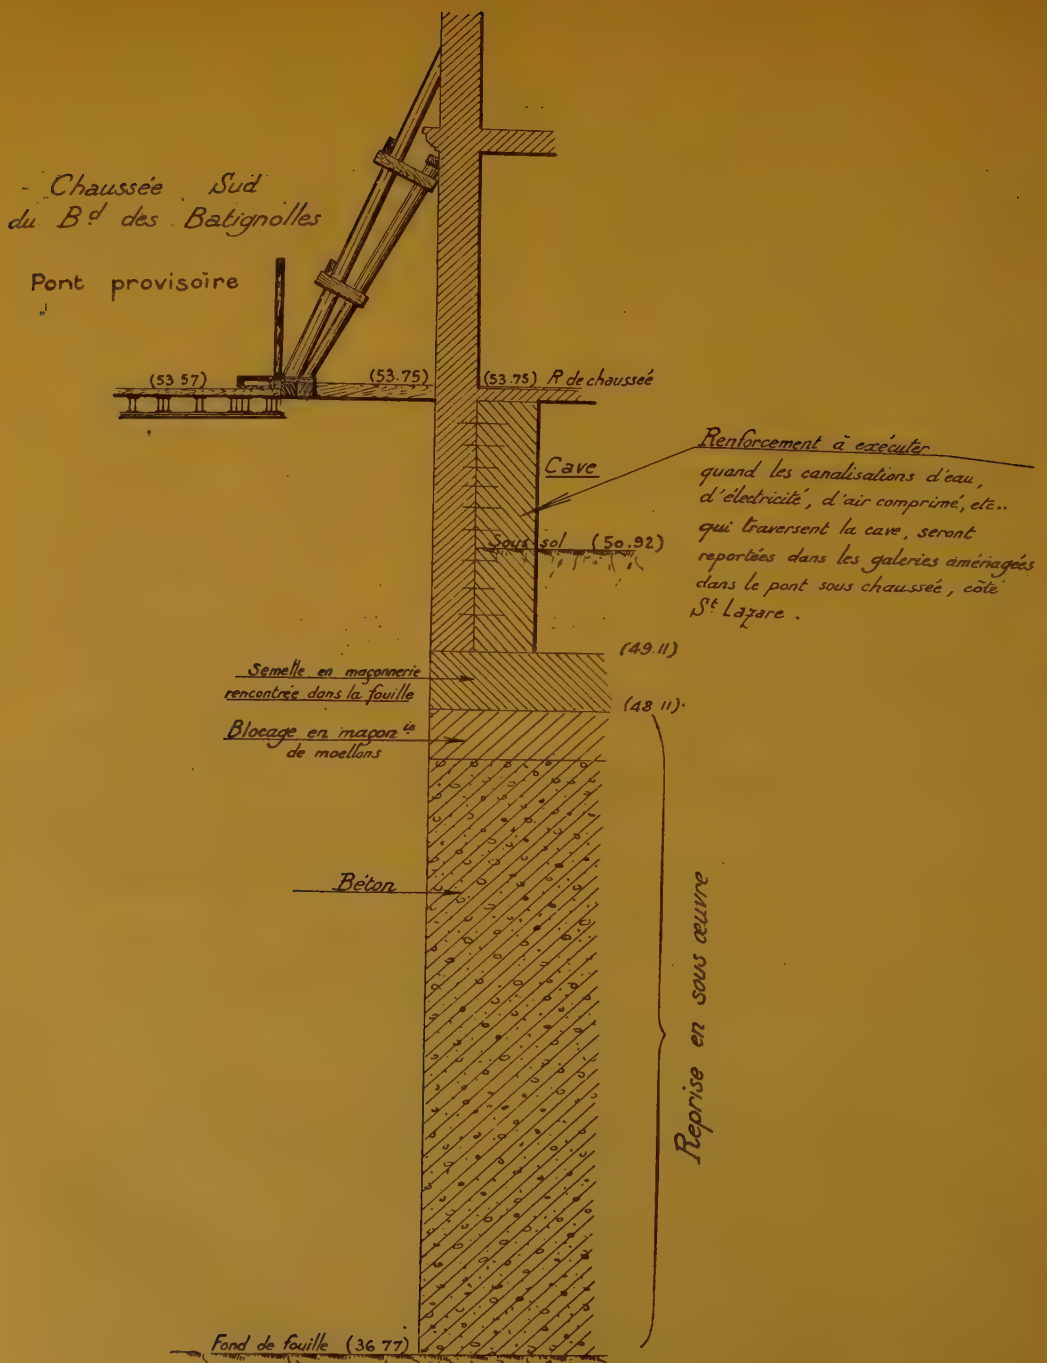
Shoring of No. 43 Boulevard des Batignolles.
